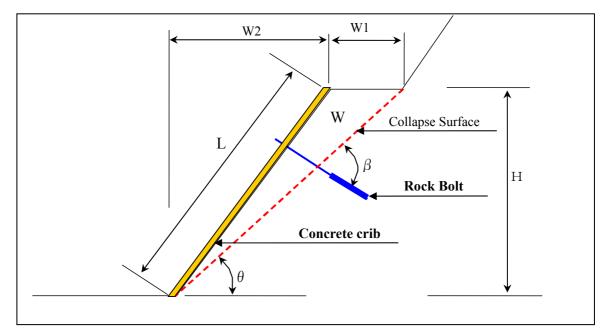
Model of Soil Slope Collapse and Arrangement of Rock Bolts
